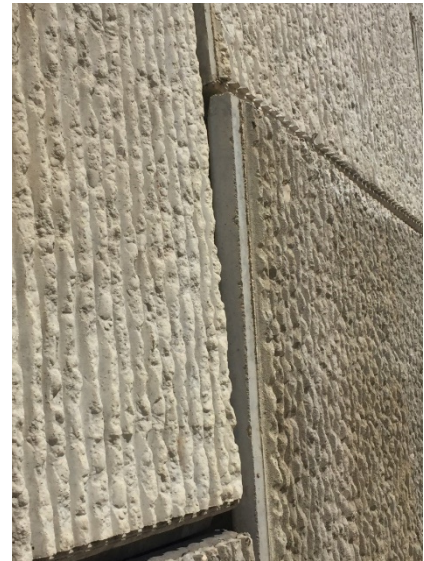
Monitored sections of Walls CC1, CC2, and CC3
